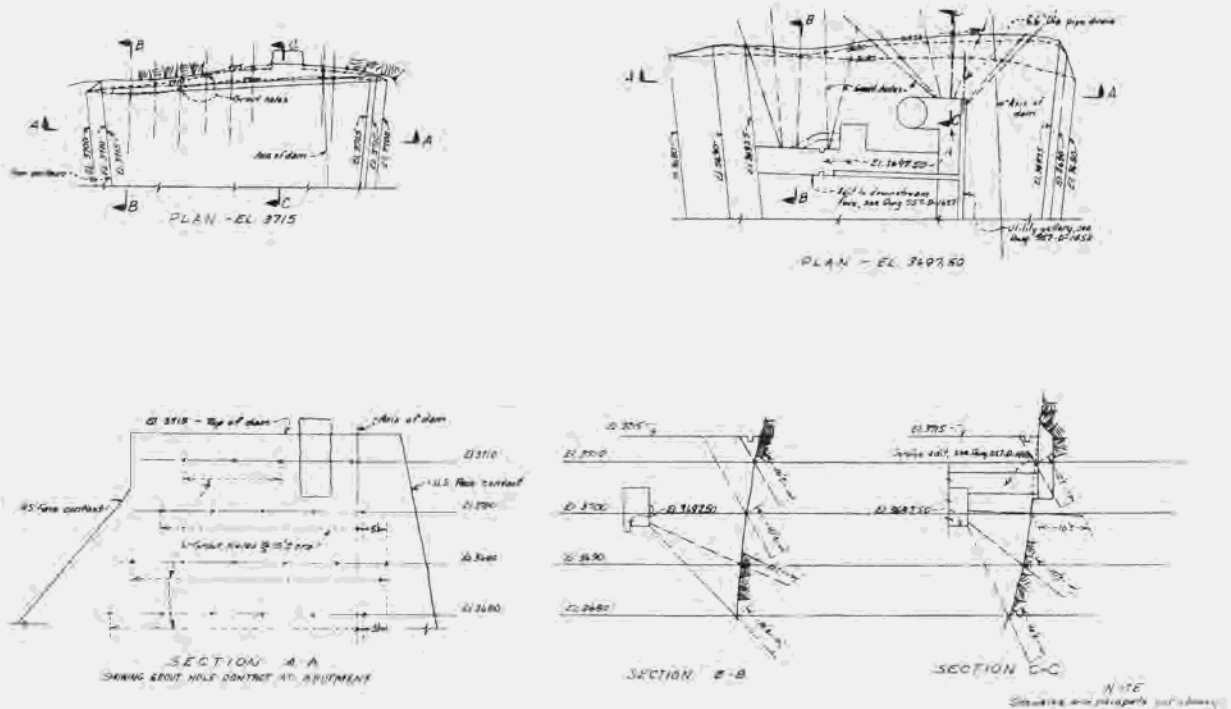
Dam right abutment—Foundation contact grouting above elevation 3680. From drawing No. 557-D-2973.
